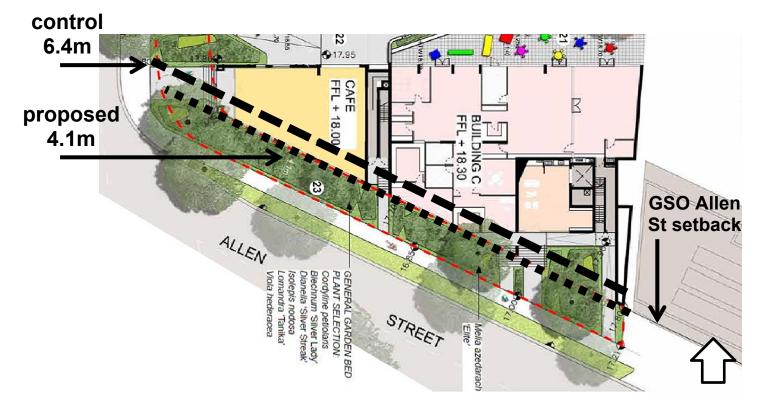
Landscape concept plan showing proposed Allen Street setback (4.1m) compared setback control (6.4m) and GSO setback.
